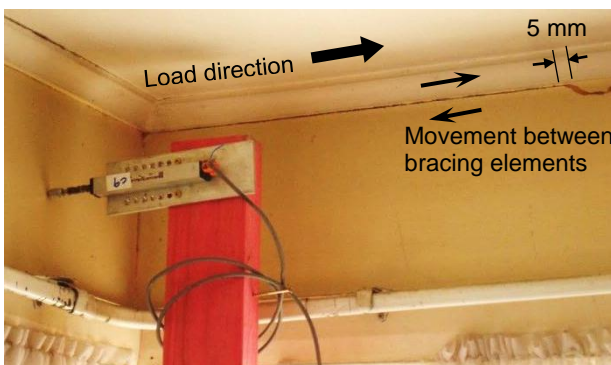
Movement of ceiling relative to wall during test, 130kN load, Bexley Rd. Photo: L. Holt
